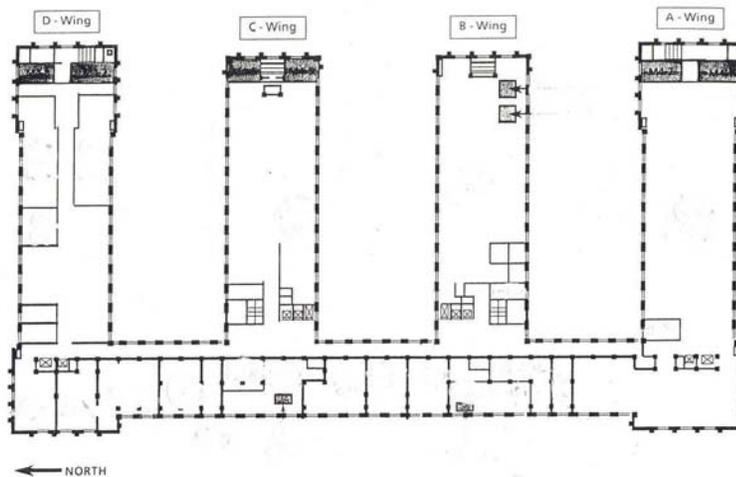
Floor plan of the Bureau of Engraving and Printing in Washington DC.
